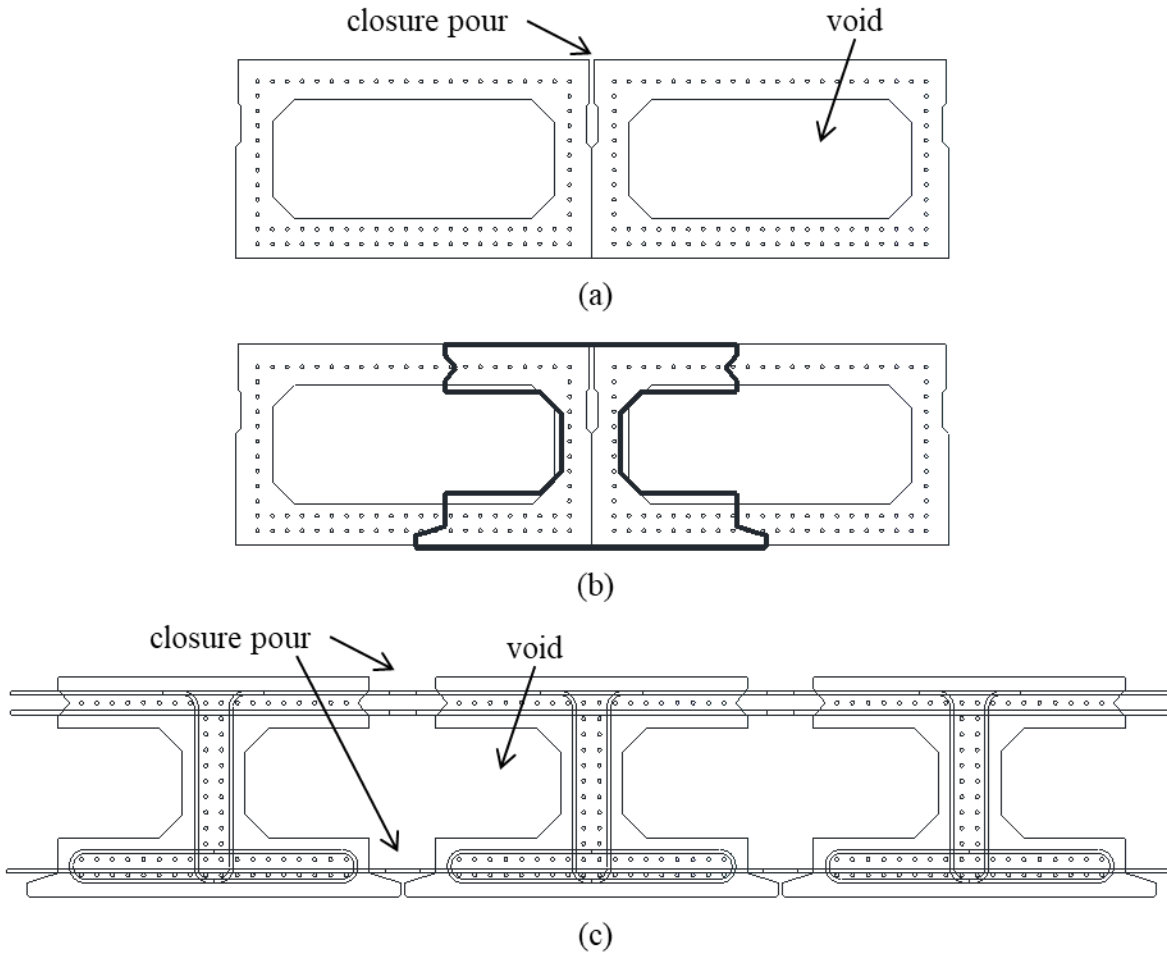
(a) Conventional adjacent box beam configuration, (b) proposed modified slab beam section shape, and (c) proposed modified slab beam configuration
